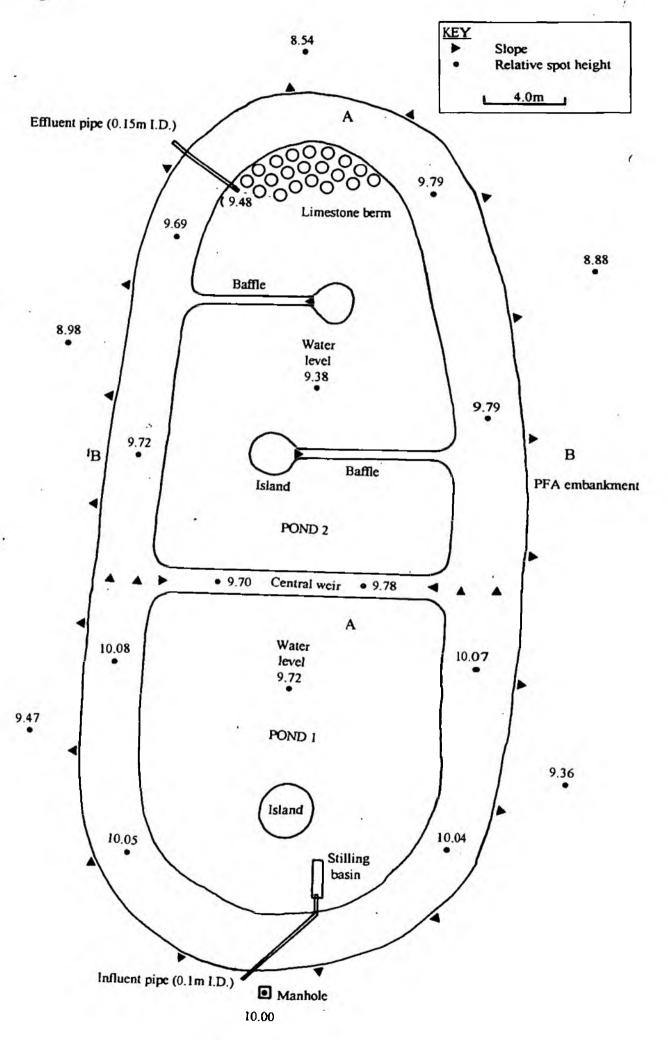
As-built plan of the full-scale wetland at Quaking Houses
